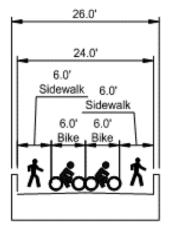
Temporary Bridge – Typical Section (At Midspan of Willamette River)
